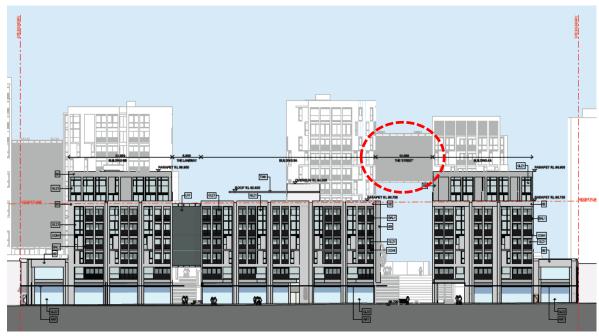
Rowe Street Elevation (Plan 1501, Revision 1)
